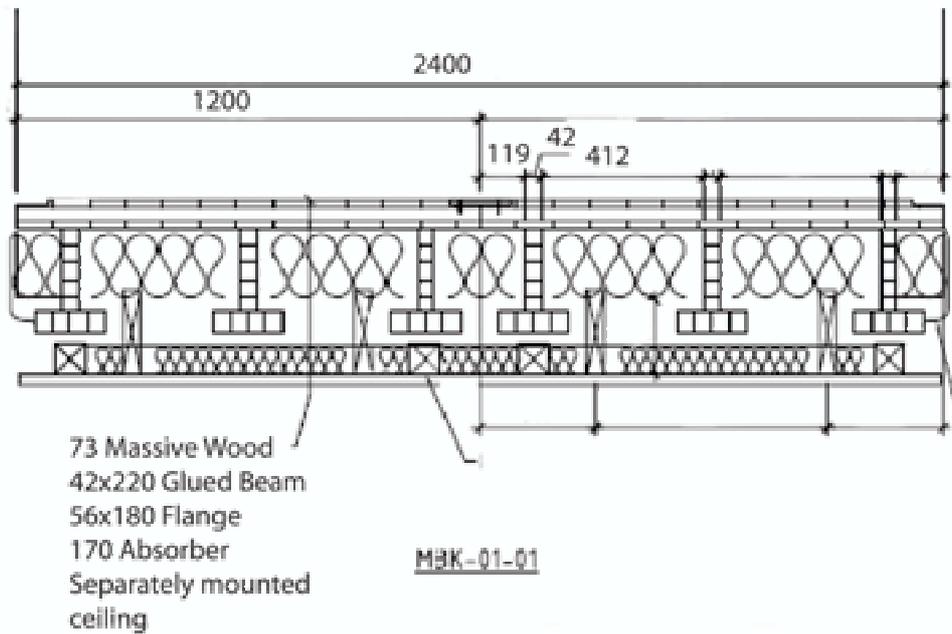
One element of the measured construction. These elements were joined to build the whole floor structure.
